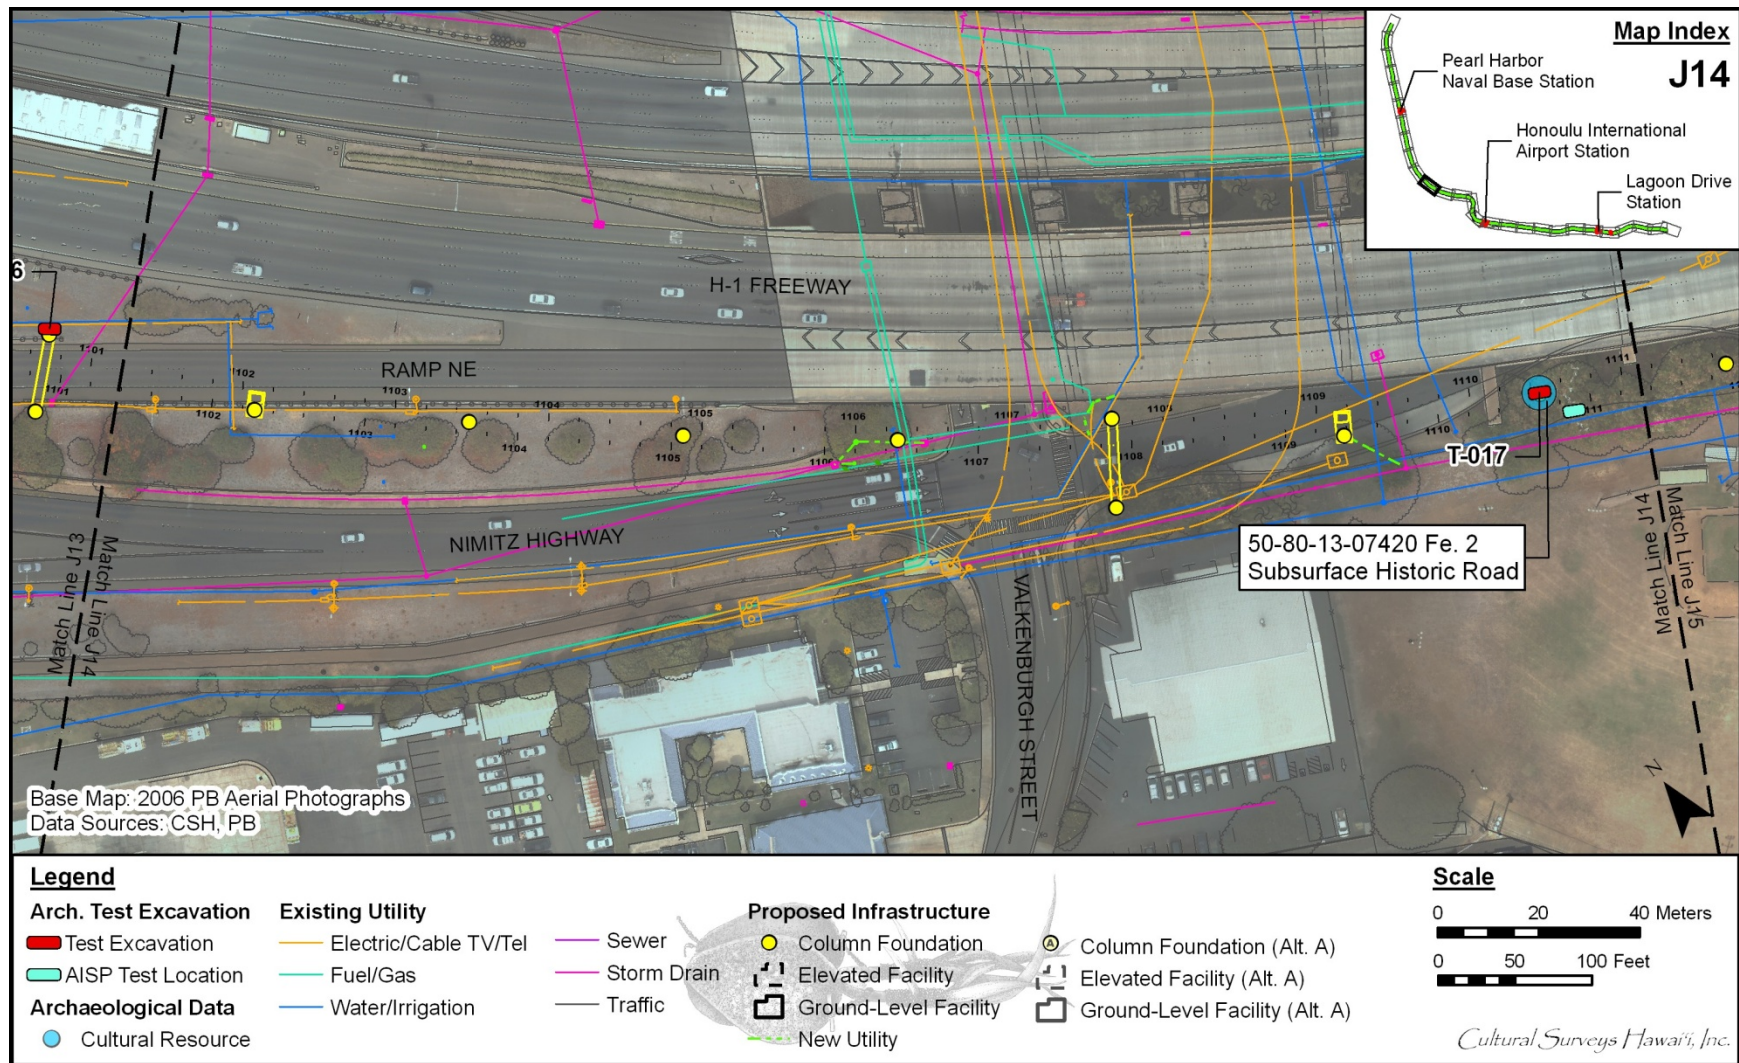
Map Sheet J14, one test excavation (T-017) at column foundation @ 1099+50
